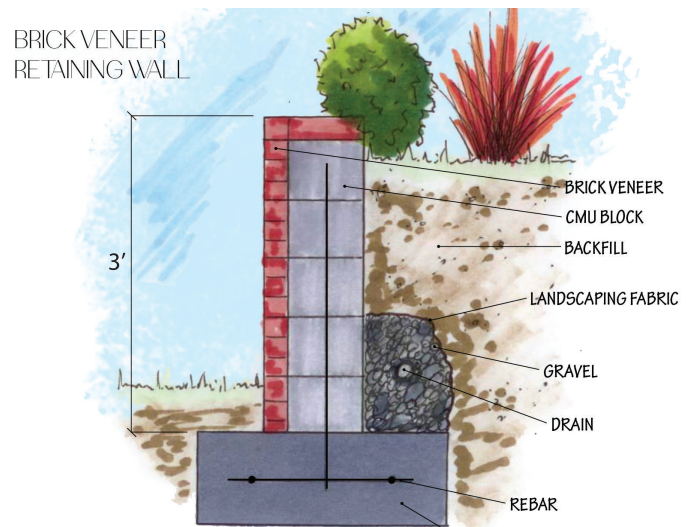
An illustrative section of a brick-veneered concrete block wall.
